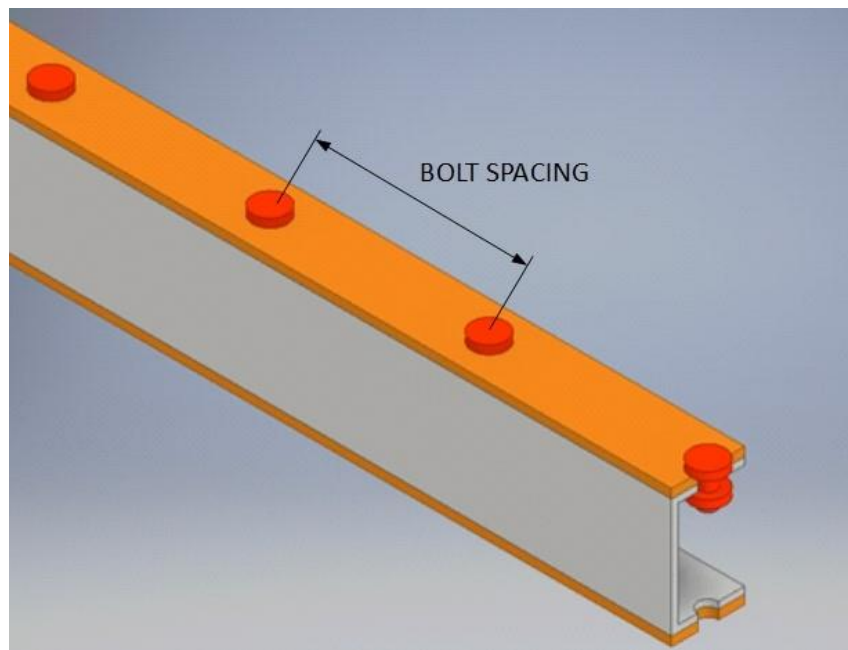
Spacing of the HuckBolts on a C-channel joined with a top and bottom plate.
